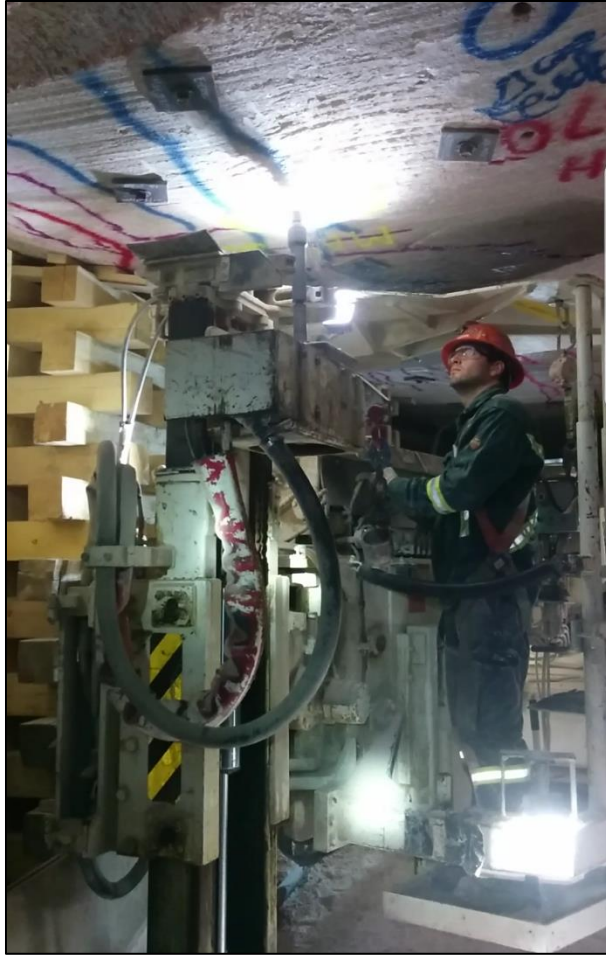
Instrumented rebar installation at Nutrien Vanscoy
